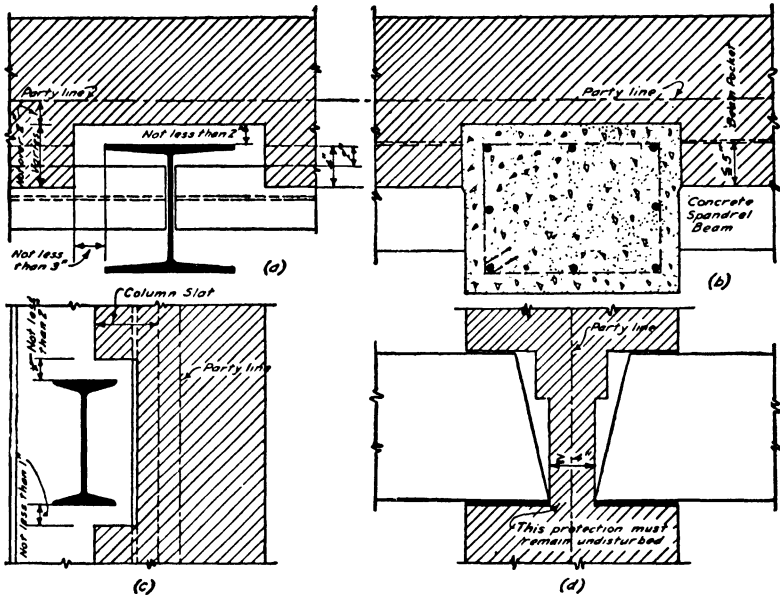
Frames on Party Lines. (a) steel column; (b) reinforced concrete column; (c) steel spandrel beam; (d) wood joist position.
